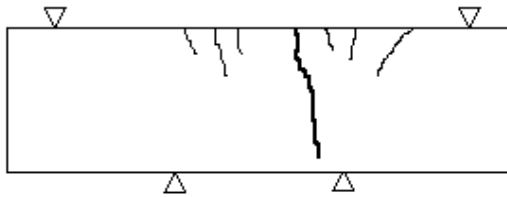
Typical failure modes for beams reinforced for flexure with Owens Corning/Reichhold.
